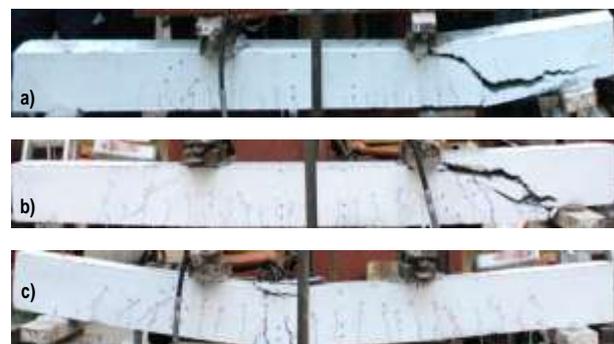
(a) Shear failure in a reinforced concrete beam containing no shear reinforcement; (b) shear failure in a reinforced concrete beam with improper shear detailing; and (c) typical flexural failure. Note the large residual deflection sustained by the beam shown at the bottom
